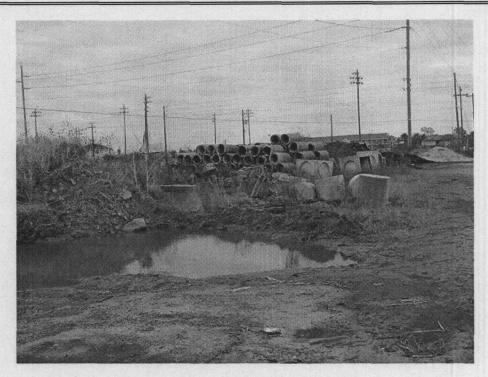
Located on the southeast of the Site. Various sizes of storm sewer pipes.
